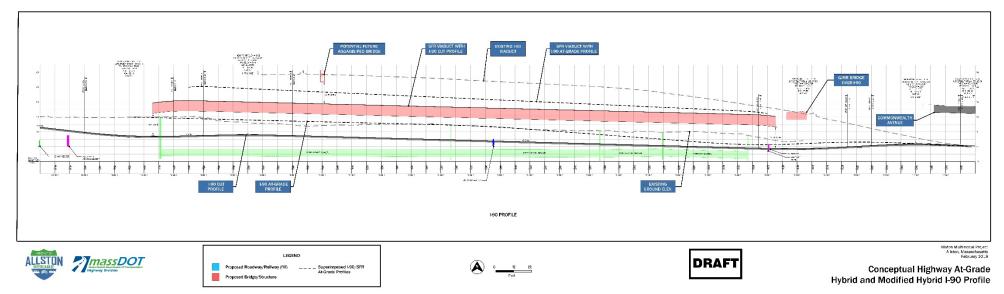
shows the differing profiles of the Soldiers' Field Road Viaduct if I-90 is placed at-grade without any additional lowering of the interstate. Placing I-90 at-grade forces Soldiers' Field Road and the Agganis footbridge to be higher to provide adequate highway clearance. By cutting or lowering I-90, the Soldiers' Field Road Viaduct and Agganis Way Footbridge can be lower though some utility impacts are triggered.
